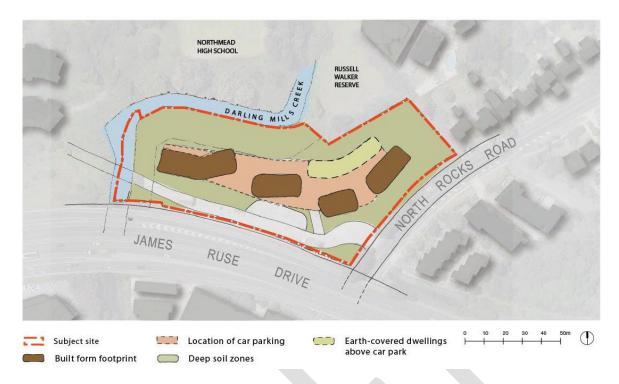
Location of parking, built form and deep soil planting
